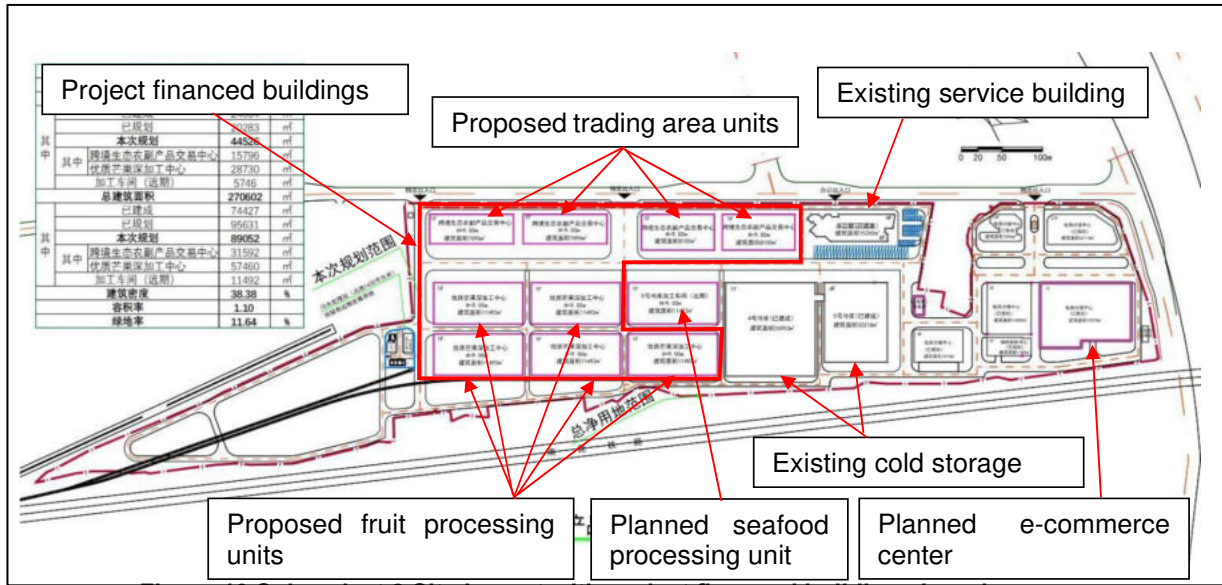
Subproject 2 Site Layout with Project Financed Buildings in Red Zone
